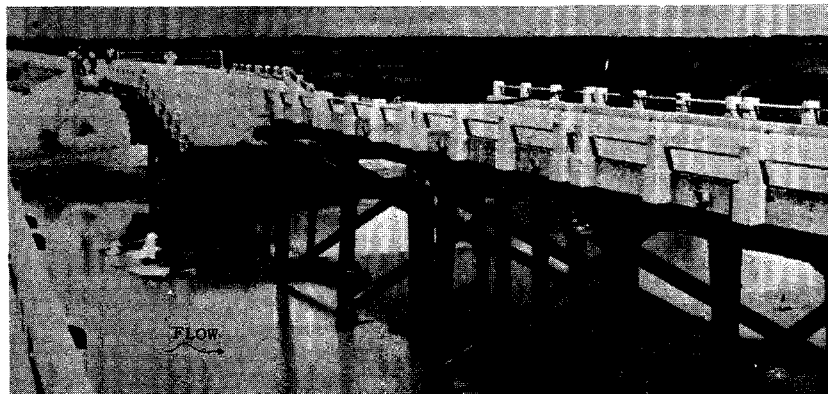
View of damaged bridge, looking north, after flooding by Hurricane Beulah in September 1967. (From Texas Dept of Highways.)
